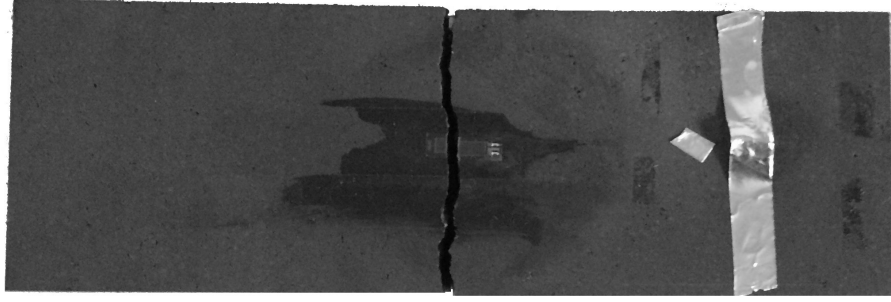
Fracture path exhibited in all uniaxial specimens.
